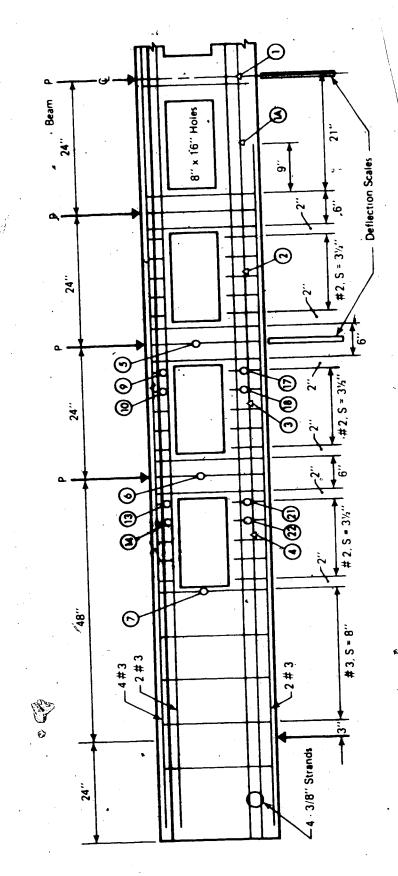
Reinforcement Details and Strain Gage Locations for Beam 8-16-7L.
